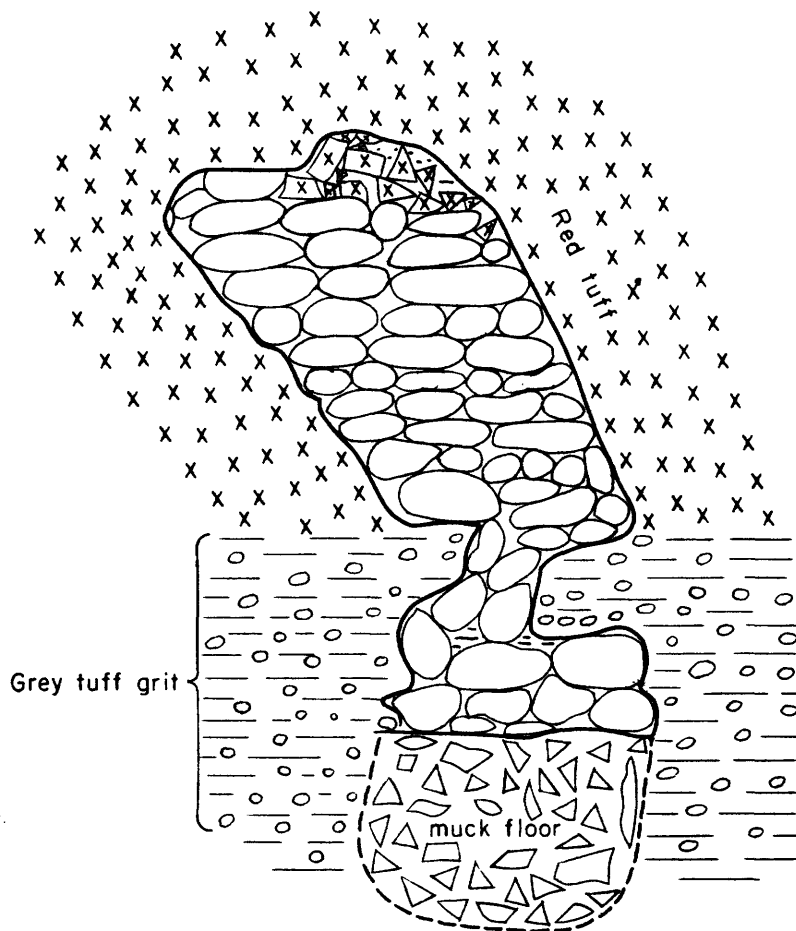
CANTED OUTLINE OF TUNNEL,
